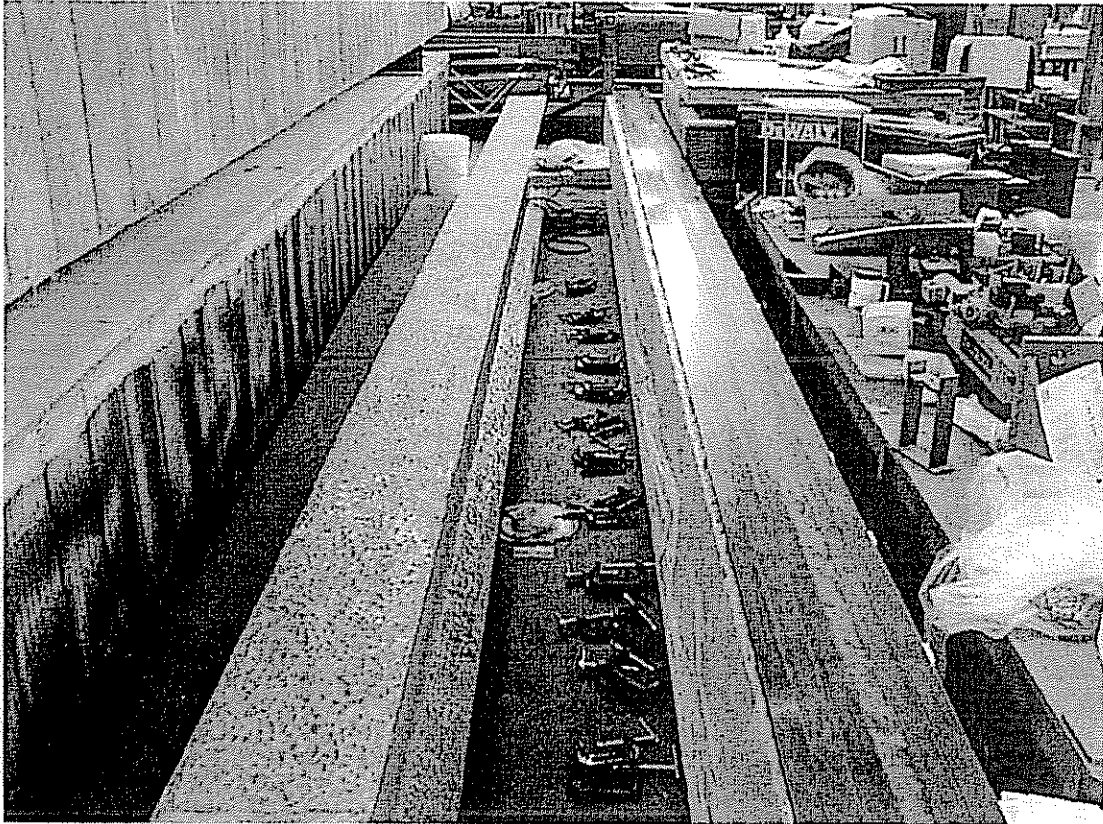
Cleaned girder surface (left) and composite assembly (right) prior to bonding. Note the C-clamps on the floor to be used in step 18.
